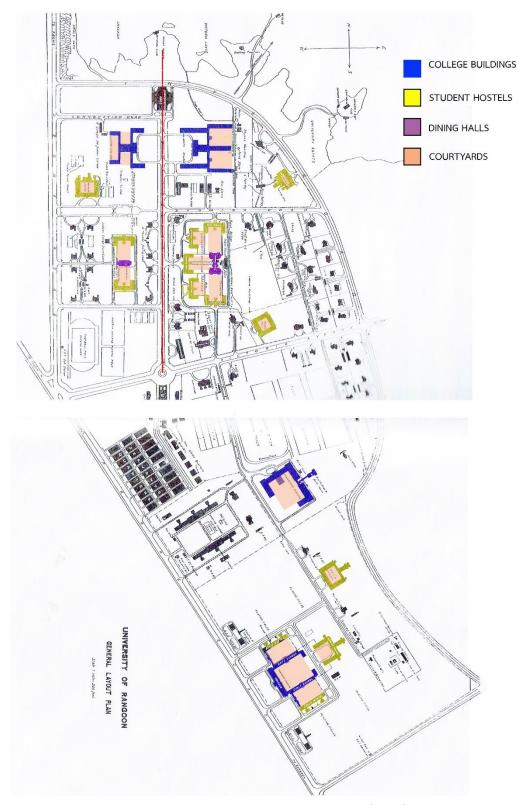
3. University of Rangoon, General layout plan (1932) (University of Rangoon: New Buildings, 1932) (edited by author)
